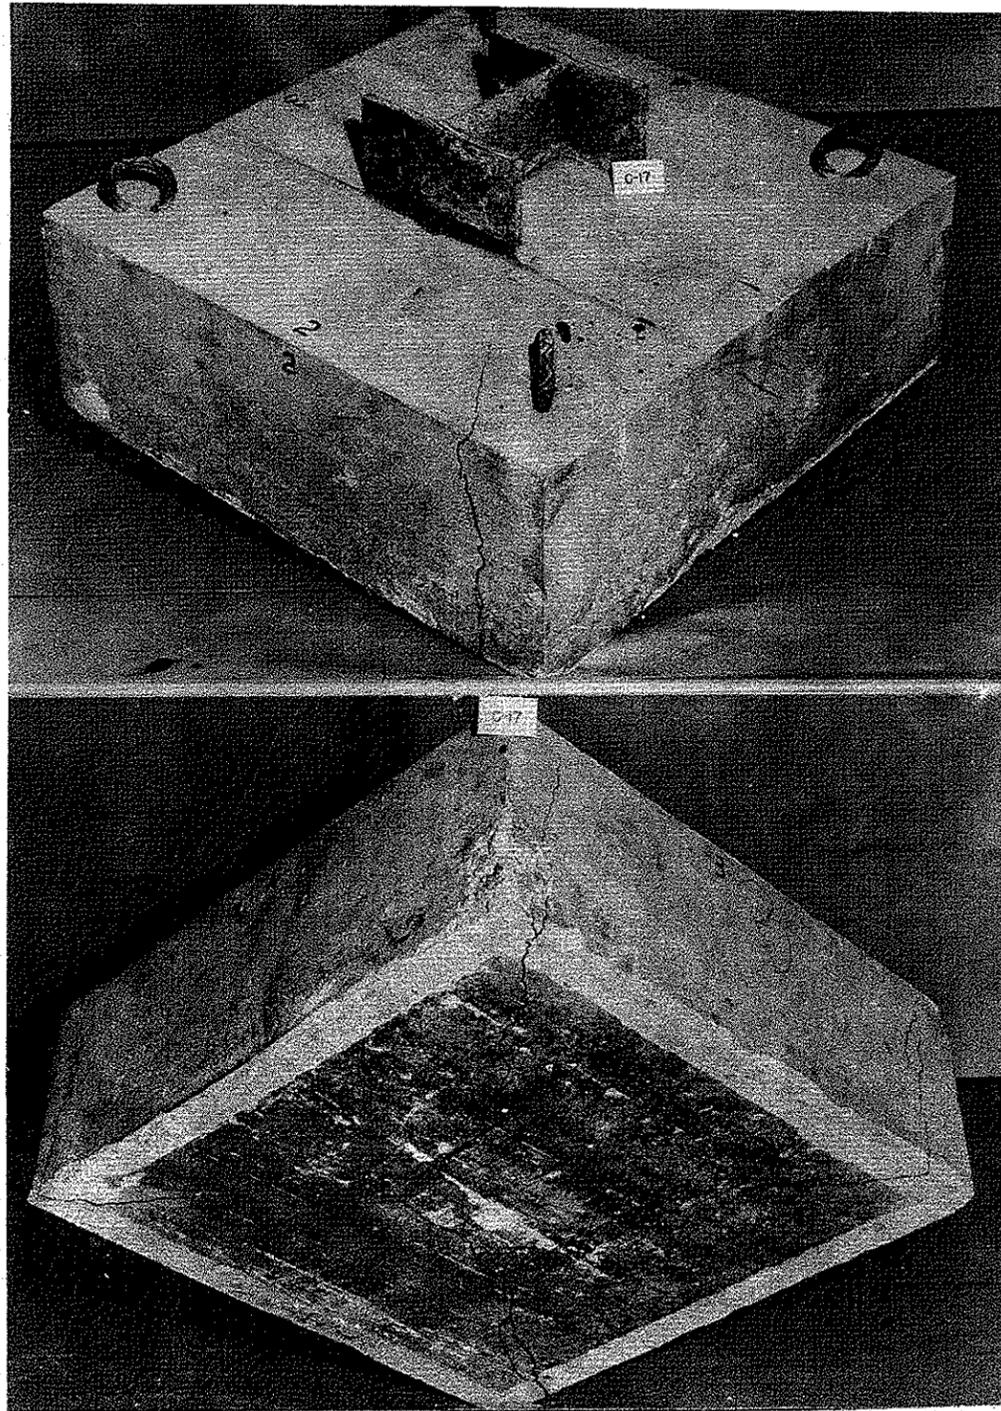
APPEARANCE OF SPECIMEN C-17 AFTER TESTING.
